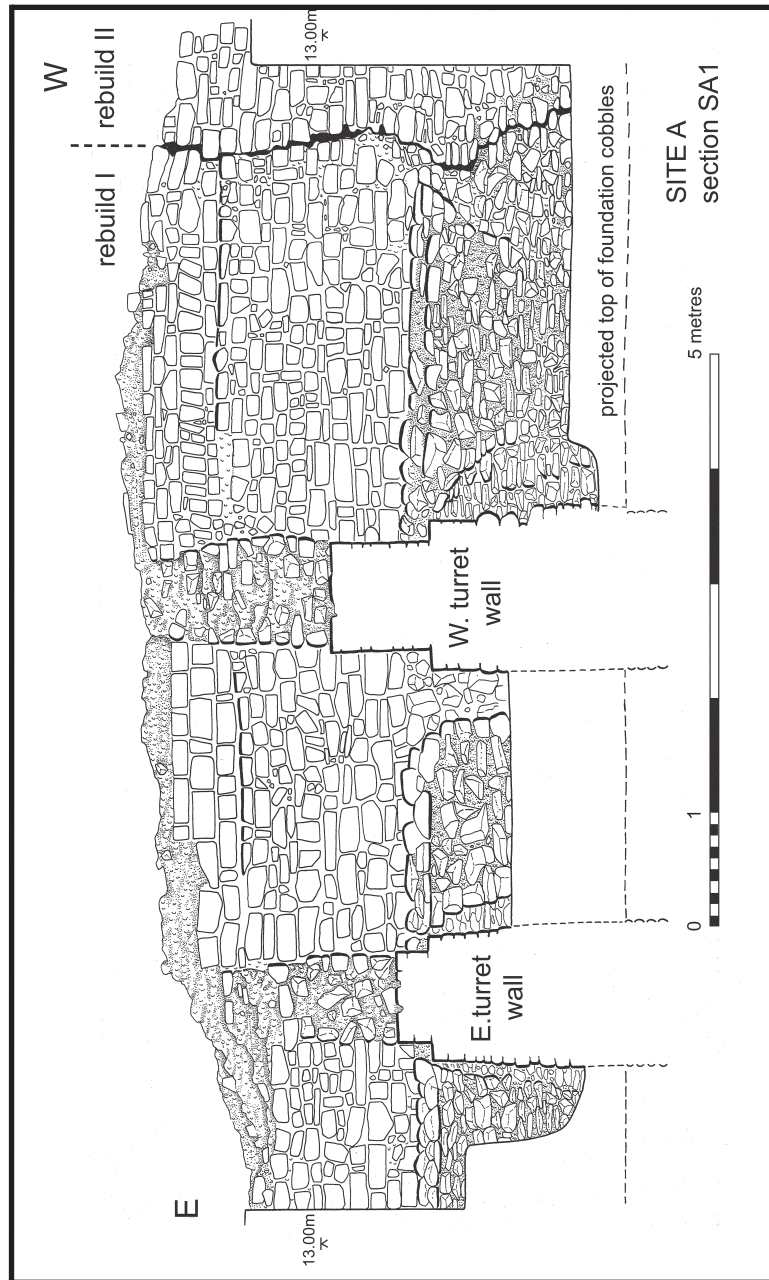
Site A Section SA1. Elevation of the inside face of the perimeter wall.
